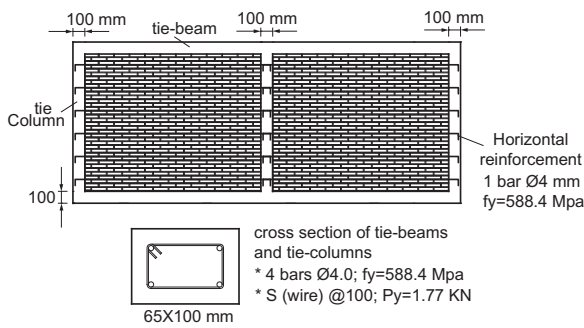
Details of reinforcement and dimensions (in millimeters) of the infill wall with confining elements.
